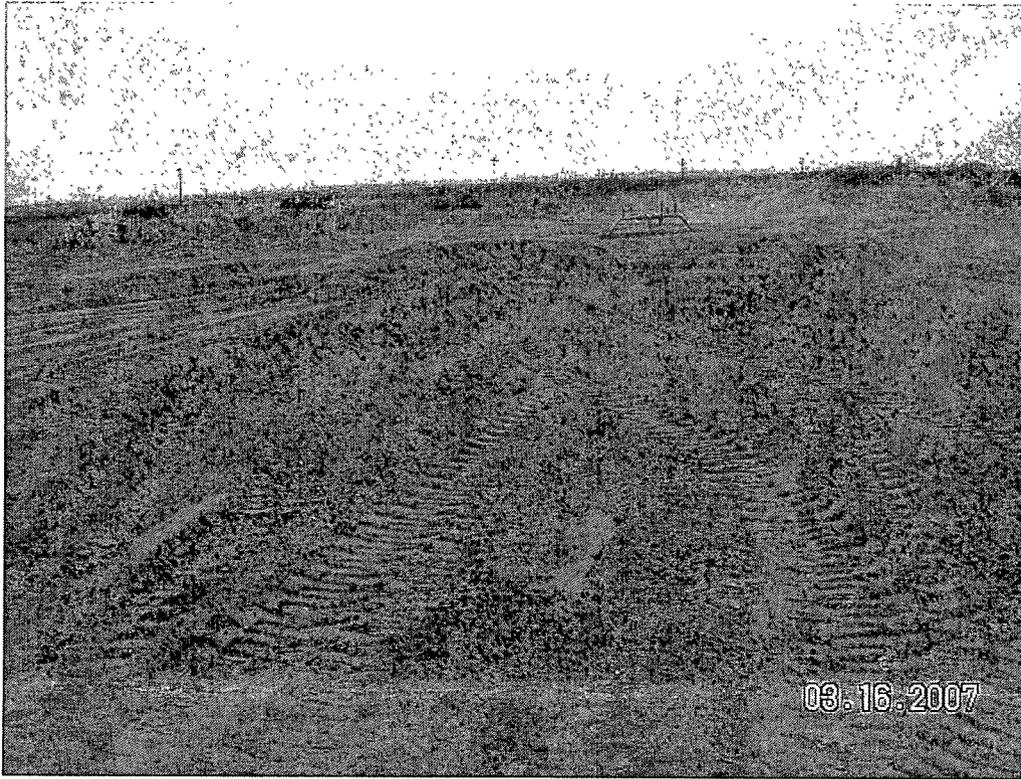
Looking easterly at excavation and benching of sidewalls.
